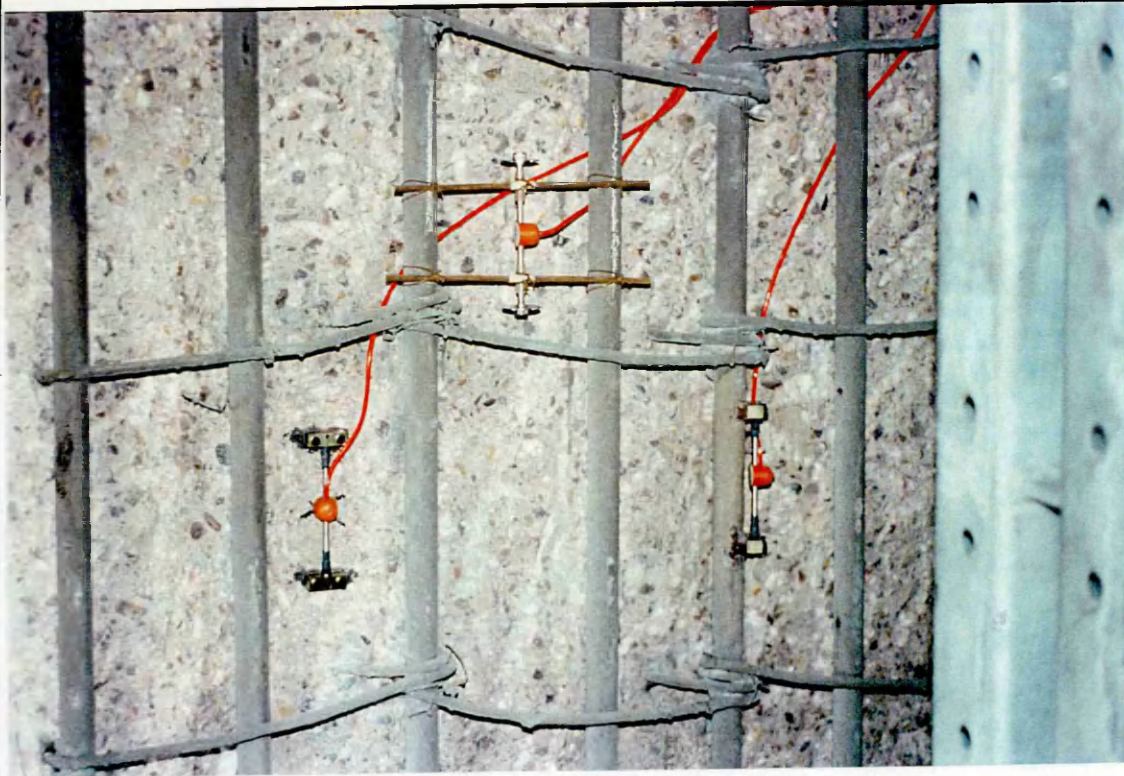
Position of gauges within a typical column repair at Sutherland Street Bridge, from left, substrate concrete gauge, embedment gauge and steel reinforcement gauge
